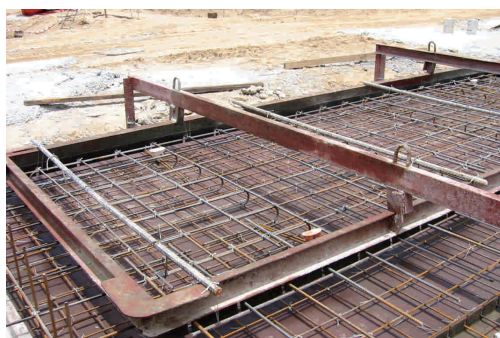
The mould for the casting of precast full slab. Rebars installed before casting
